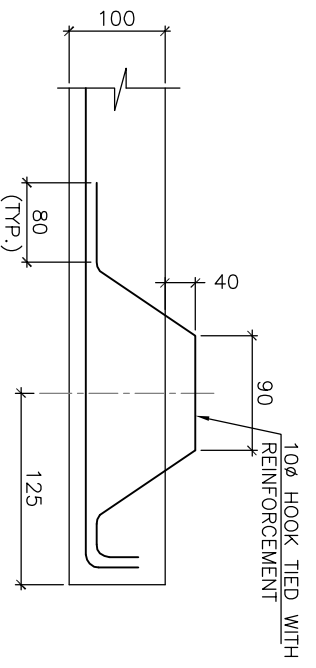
DETAILS OF PRECAST CUTOUT COVER - PLAN
